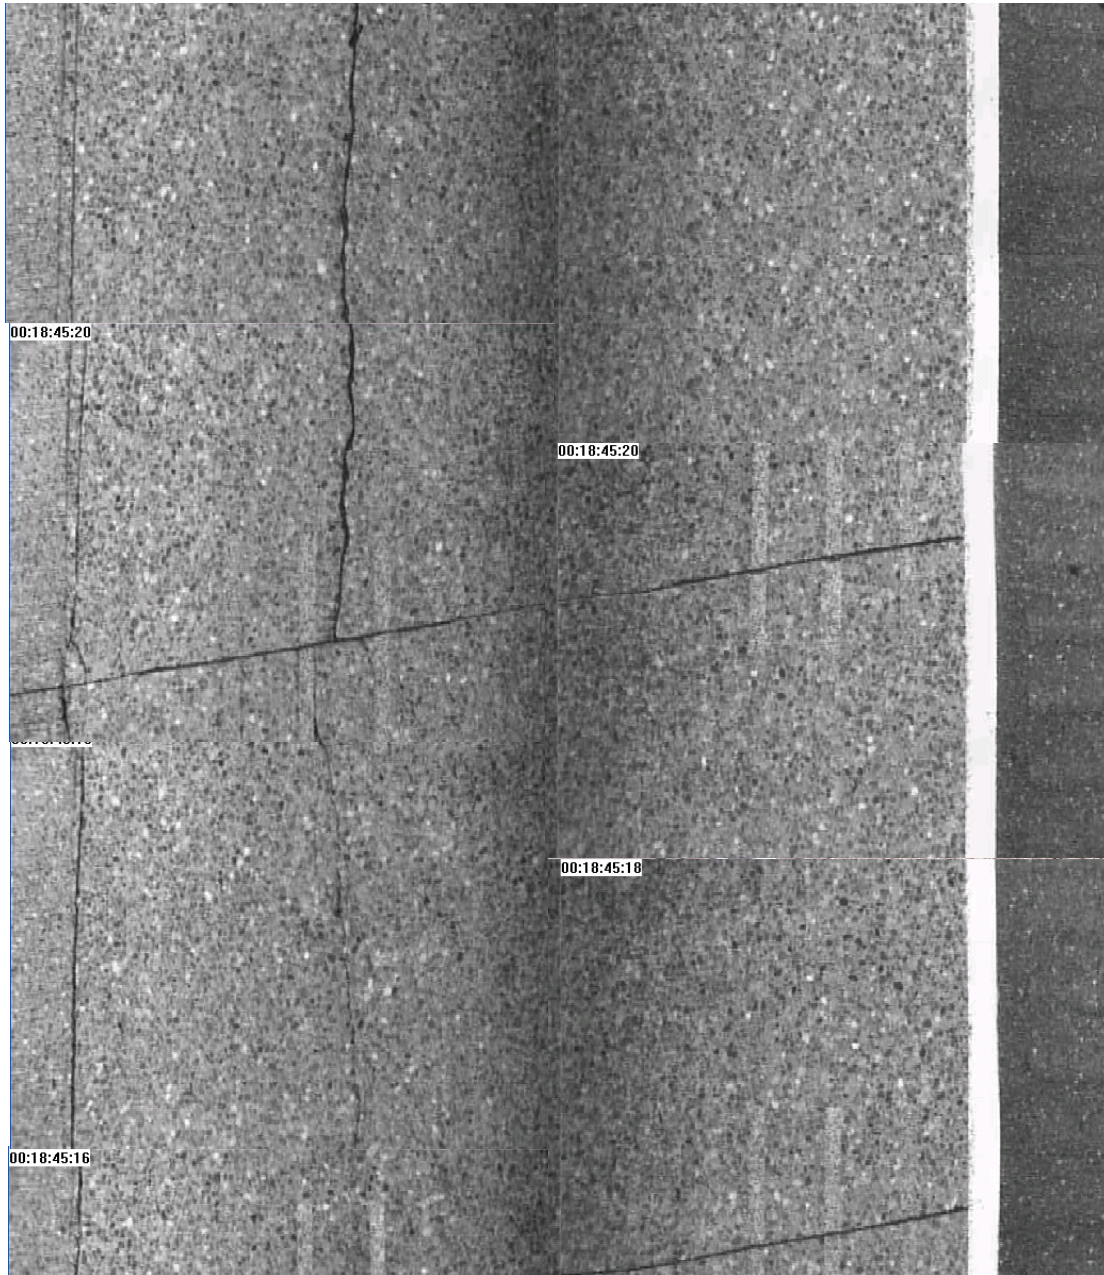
Propagation of existing longitudinal crack after dowel bar retrofit.
